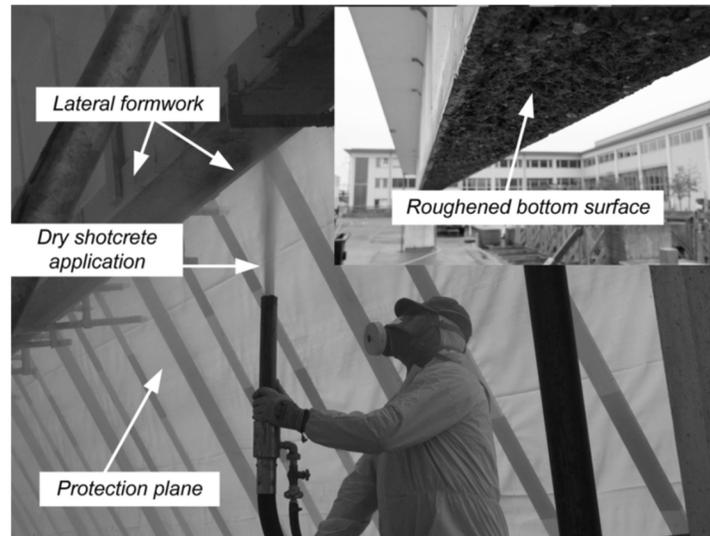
Application of shotcrete for leveling the initial camber in the girder [87]
